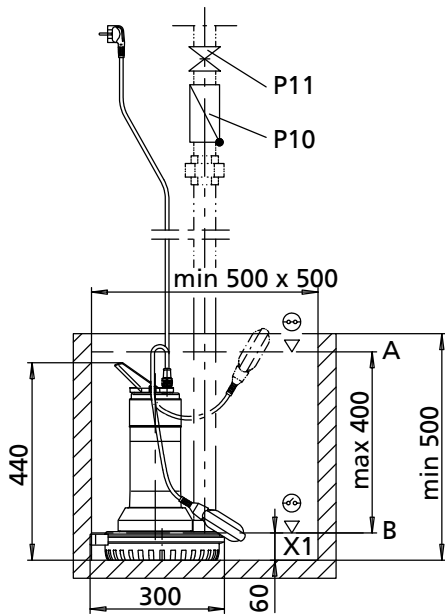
Outline drawing Ama-Drainer 4..SE/10 without cooling jacket
